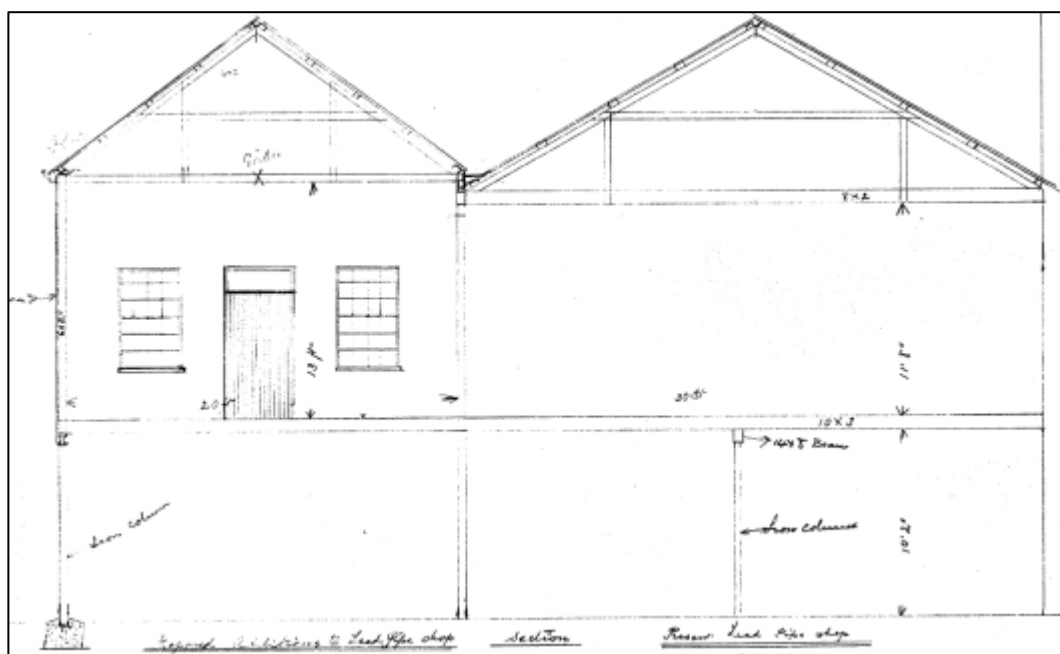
1902 plans for the addition to the lead pipe shop (DCC Archives).
